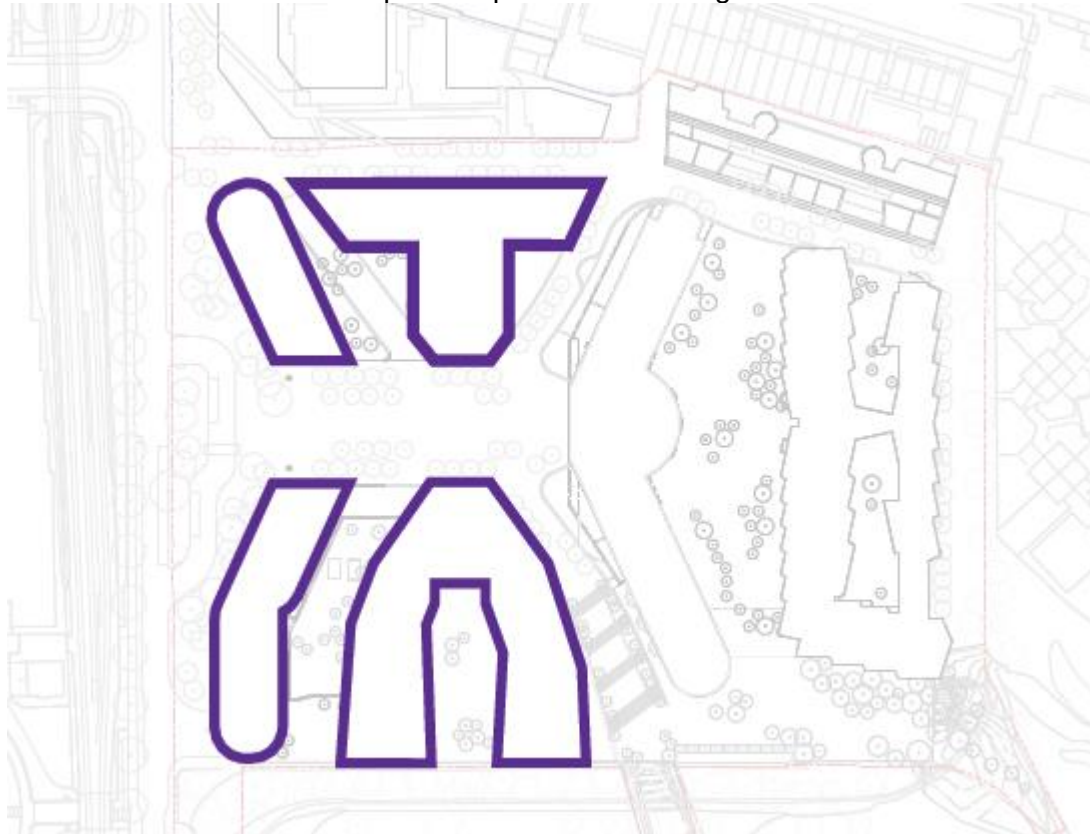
Proposed residential uses (upper floors) for outline component (from Parameter Plans)
